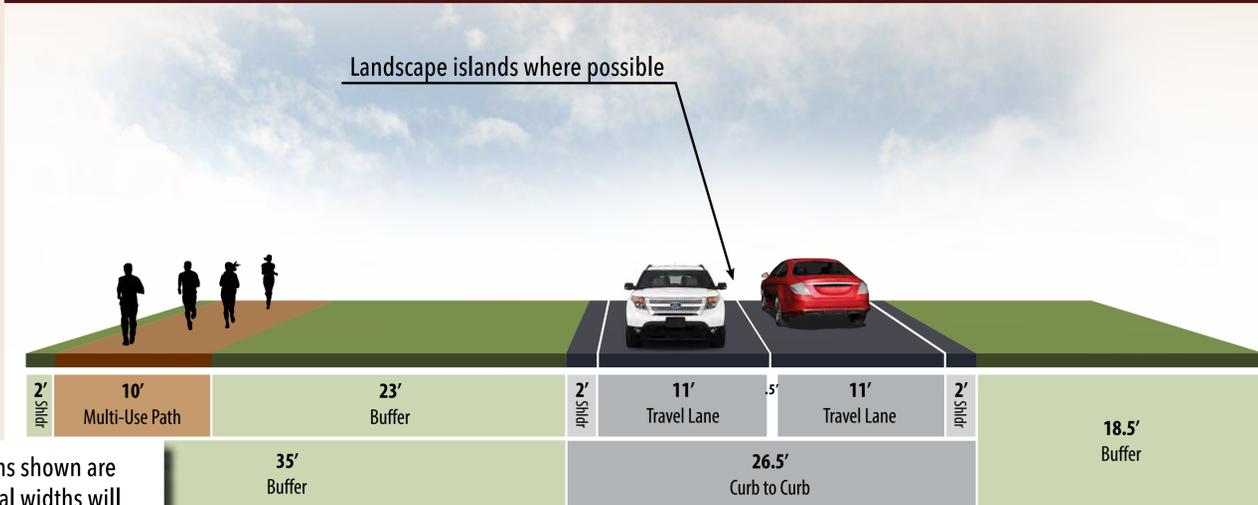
# PHOTO SIMULATIONS AND PROPOSED TYPICAL SECTION
